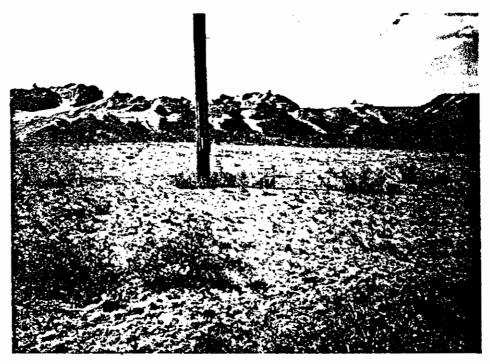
Showing area previous occupied by three (3) surface impoundments, now undergoing closure.
